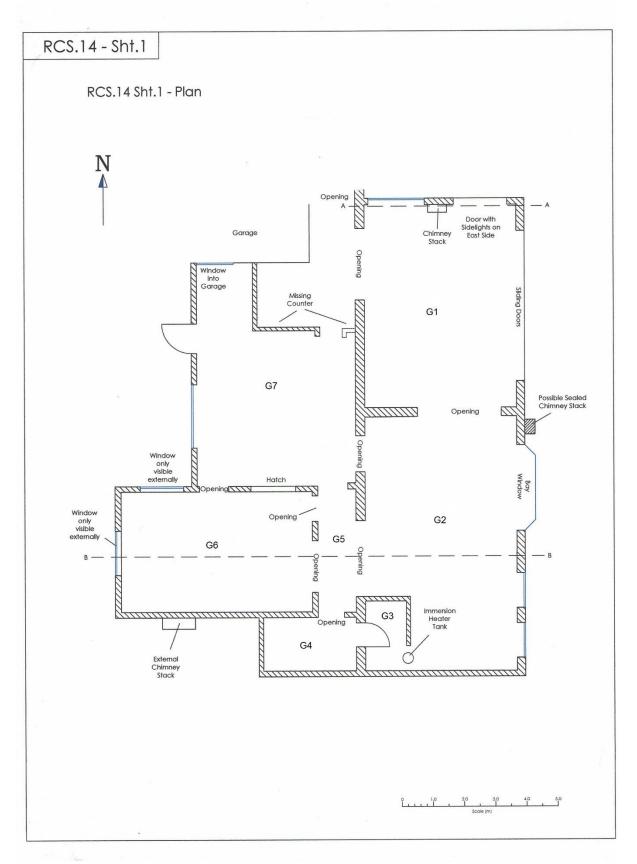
Rosehill Country Store: Plan of main buildings at the site
